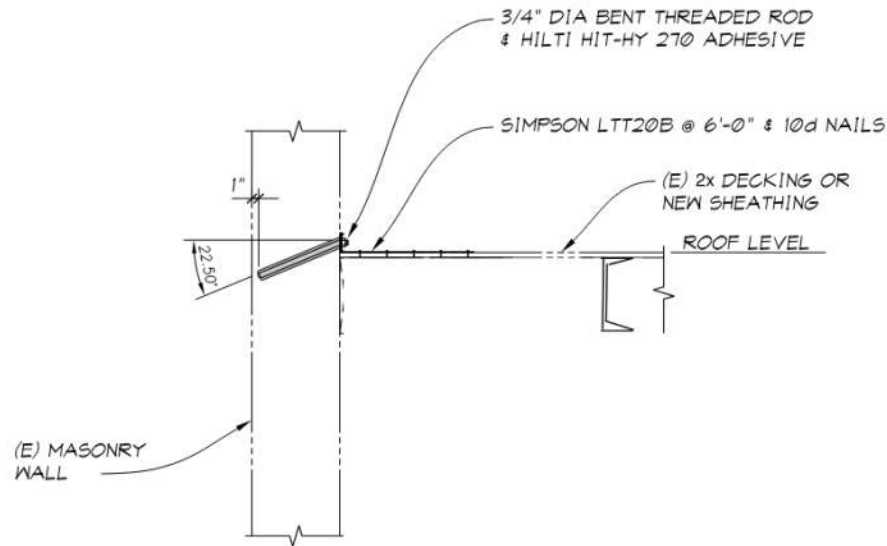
South Building Wall to Level Roof Anchorage – IEBC 2021 (sections 906.4 and 906.5) Compliance Detail
